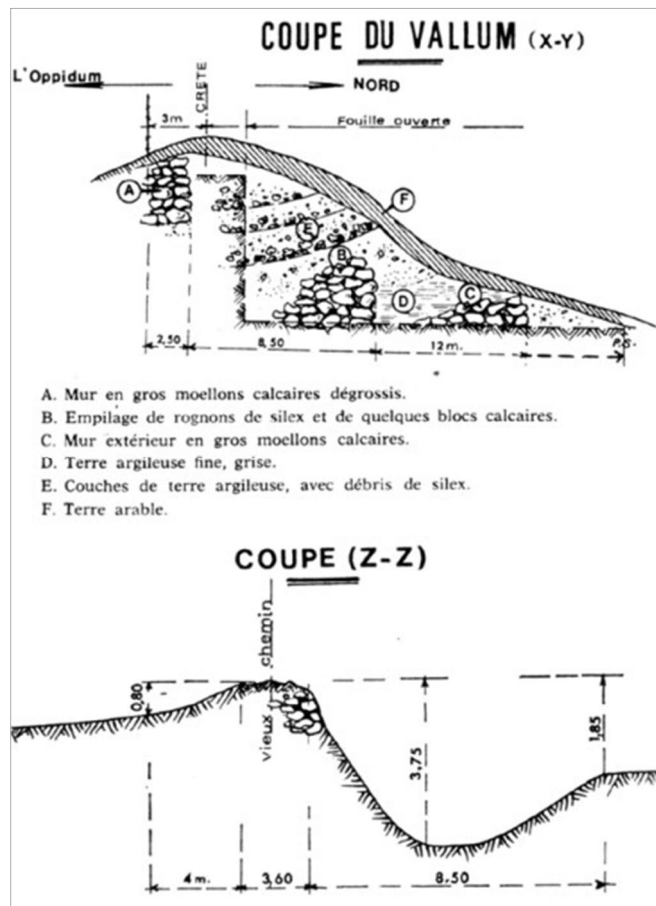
Sections through the walls at Pons (Lassarade 1986: fig. 4)
